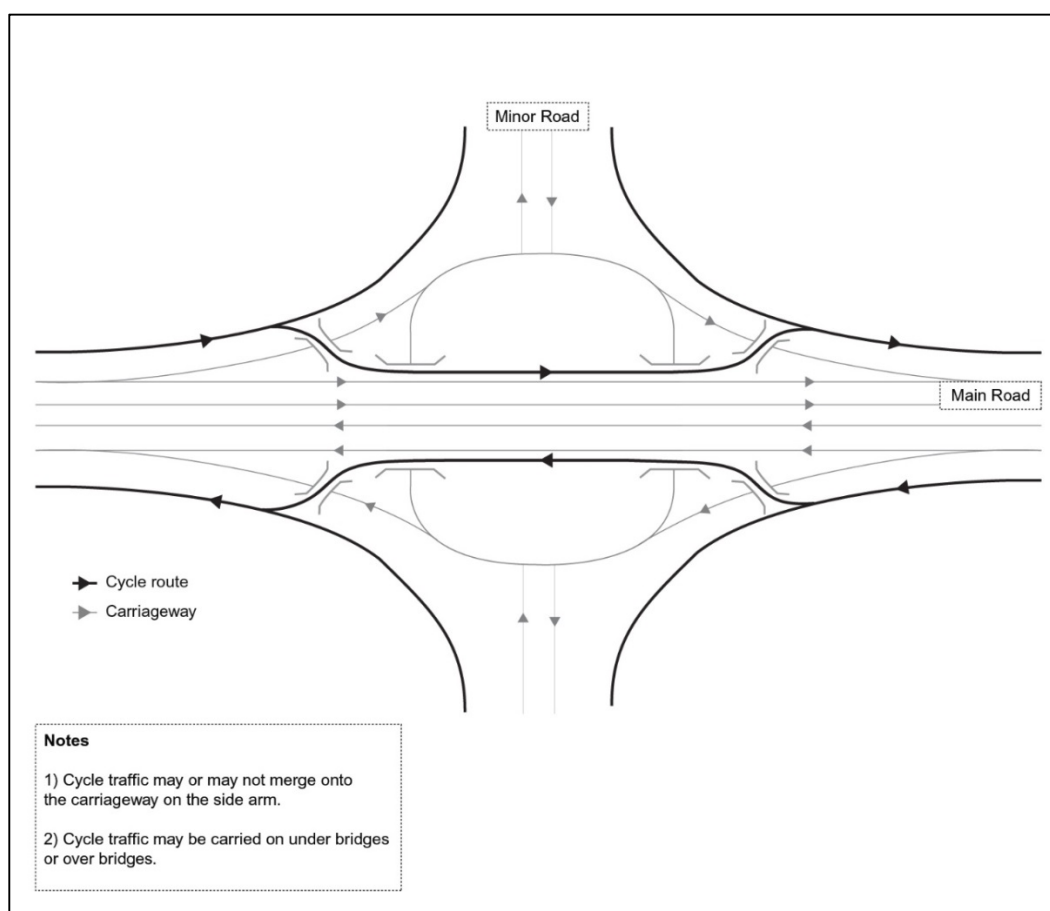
Two Bridge Grade Separation with Minor Road on Overbridges
